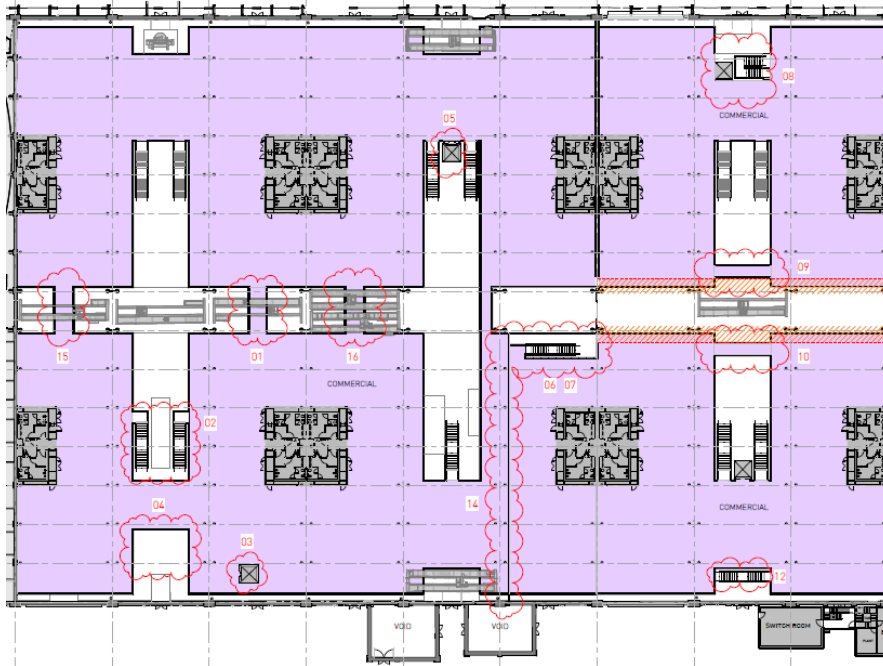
Approved First Floor (Source: Sissons, 2019)
